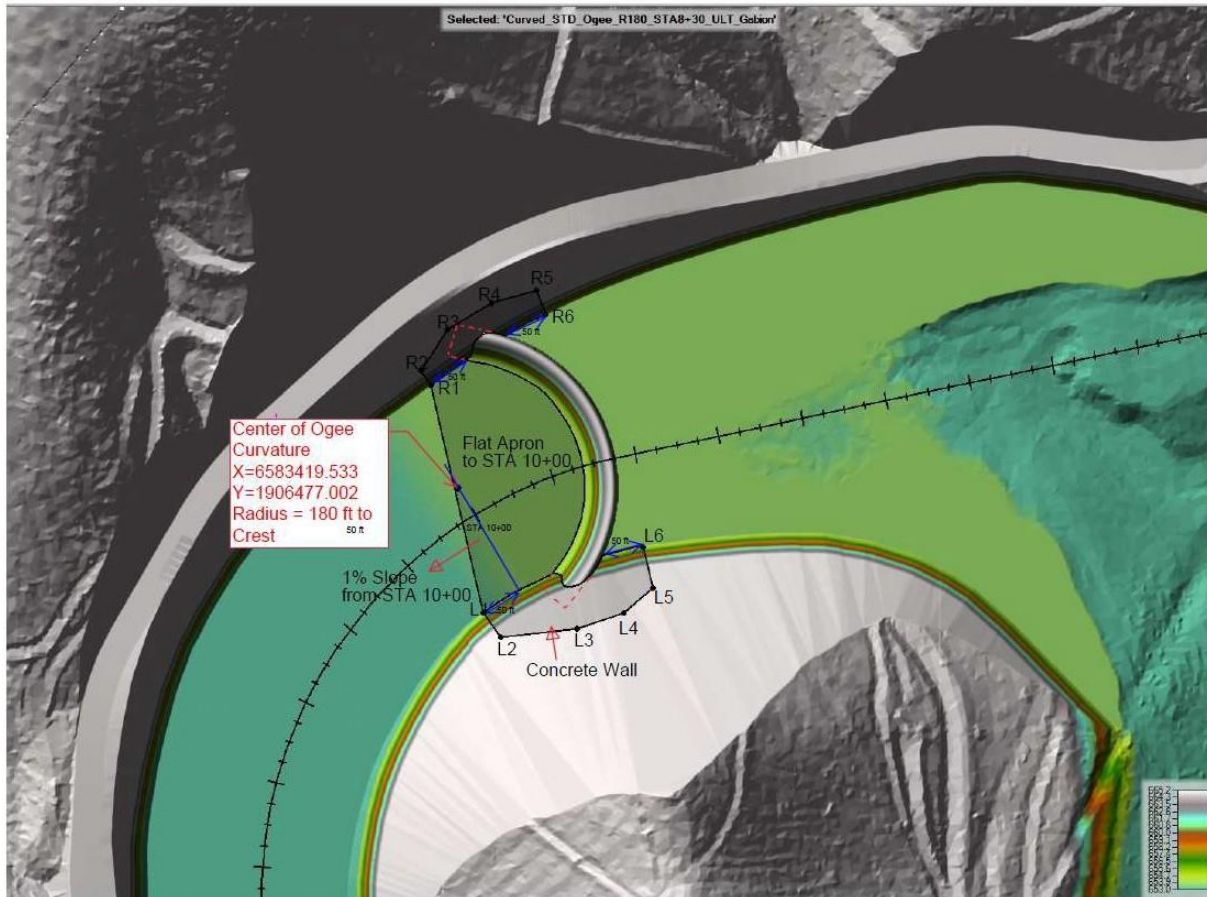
Configuration of the 10-foot tall concrete ogee weir across the widened emergency spillway. Concrete wall elevations: R2=670'; R3, R4=688'; R5=678'; L2=670'; L3, L4=688'; and L5=678'. Downstream concrete apron extent: line connecting R1 and L1 from the ogee. Standard radius of curvature = 180'.
